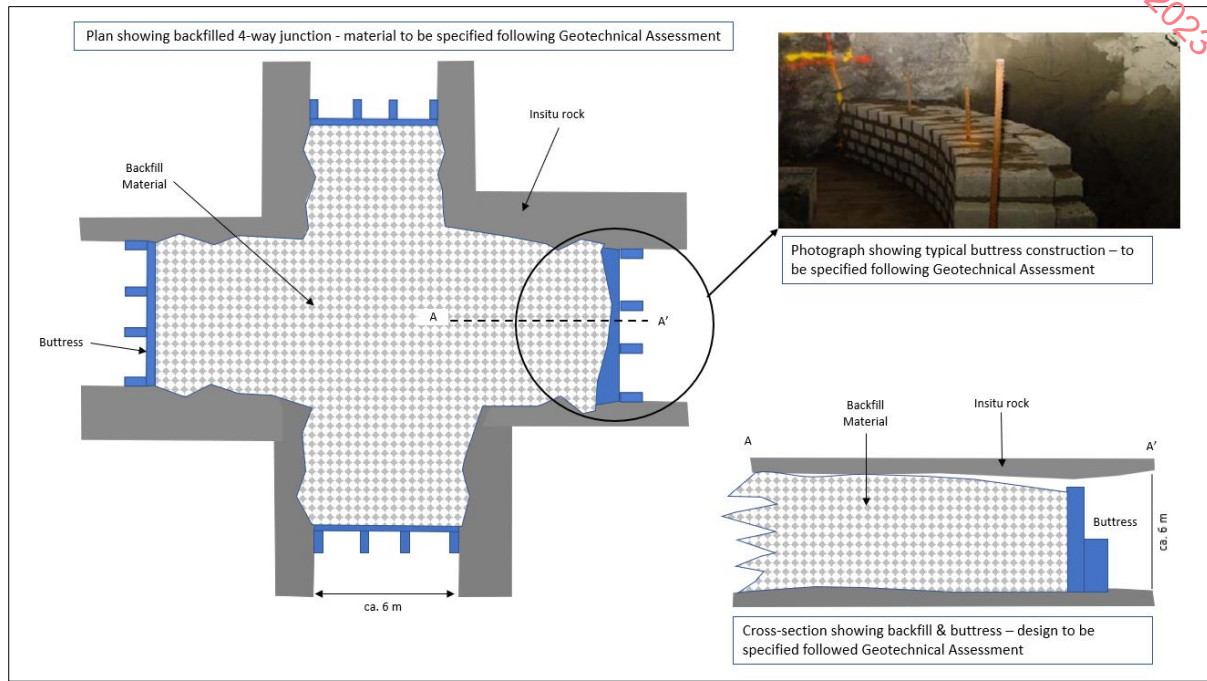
Schematic plan and cross-section for the backfilling of a 4-way junction
